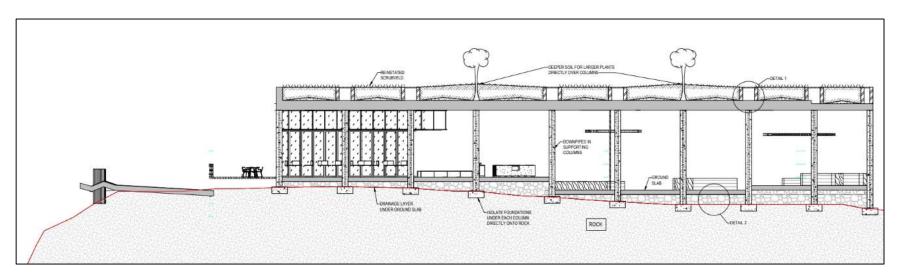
Drawing illustrating the concept of roof planting and building drainage system
